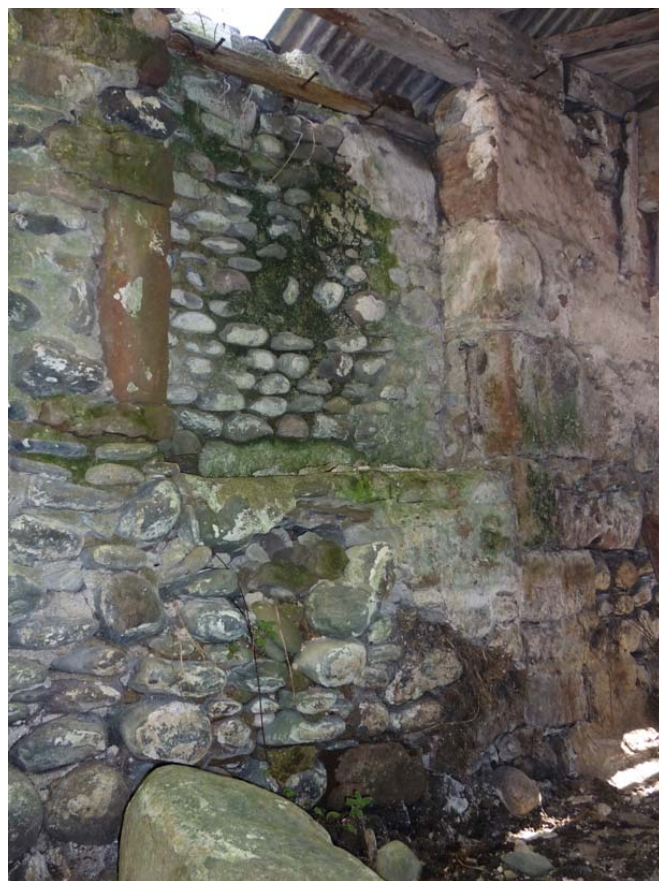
(left): Blocked door in the south elevation of Building 3, viewed from inside Building 4
